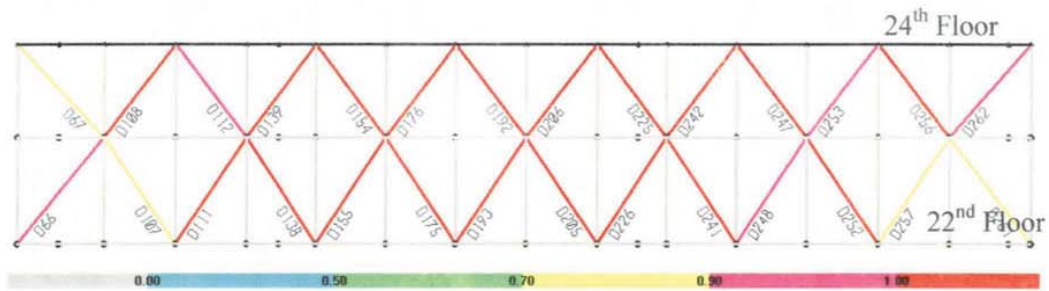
East Belt Truss between floors 22 and 24 diagonal diagram
